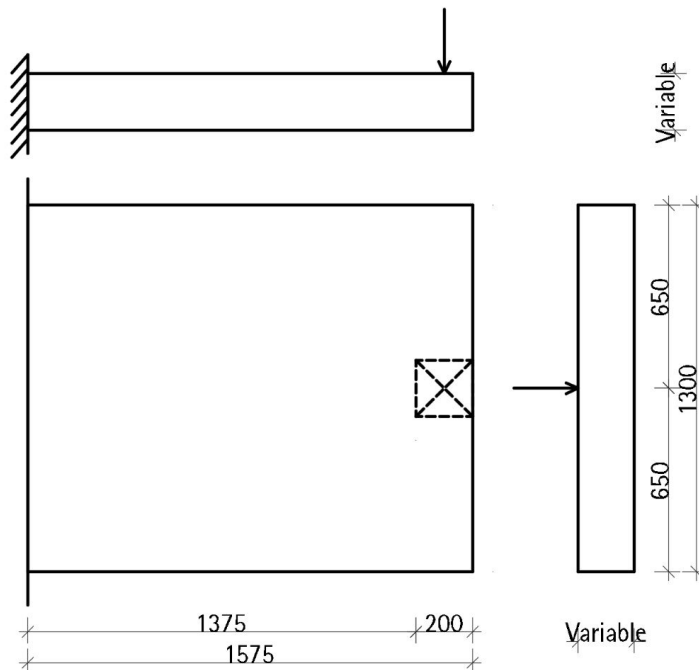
Schematic drawing of simple fully clamped cantilever balcony.
